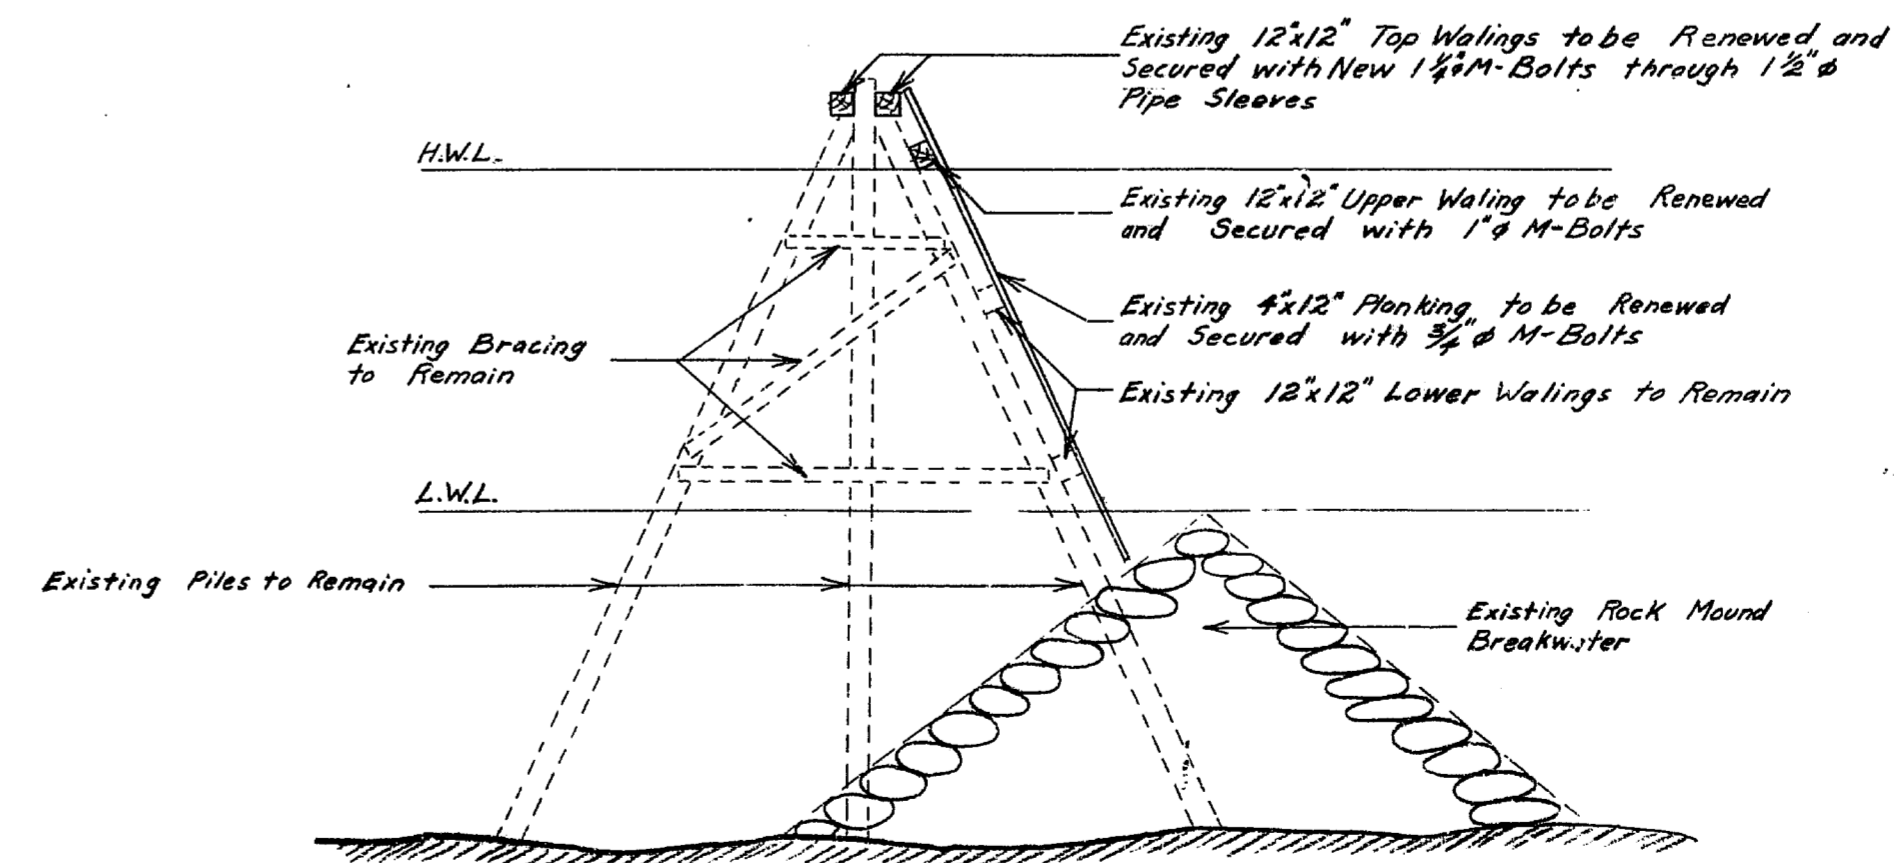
BREAKWATER SECTION Scale: 1/8" = 1'-0"
